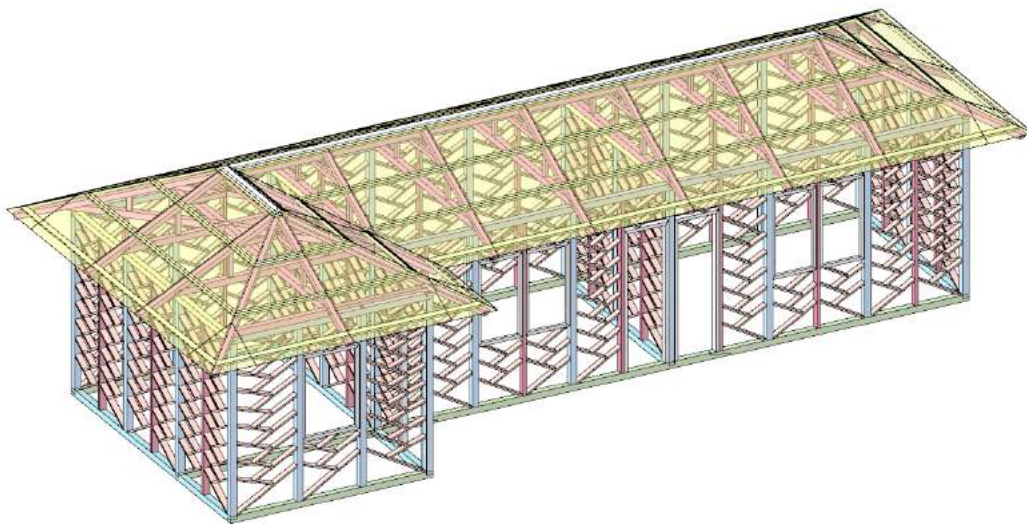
Dhajji dewari building with alternative timber framing configuration requiring engineering assessment
